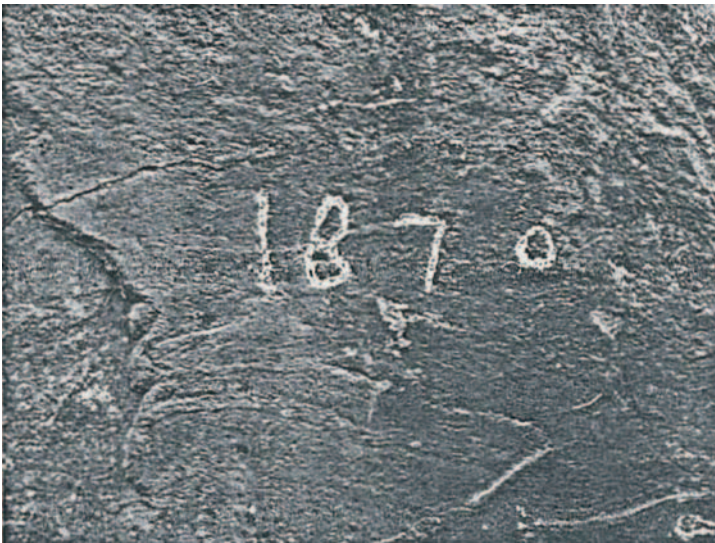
Year of Construction, Engraved on the Protection Wall (Raffeiner 1990).
